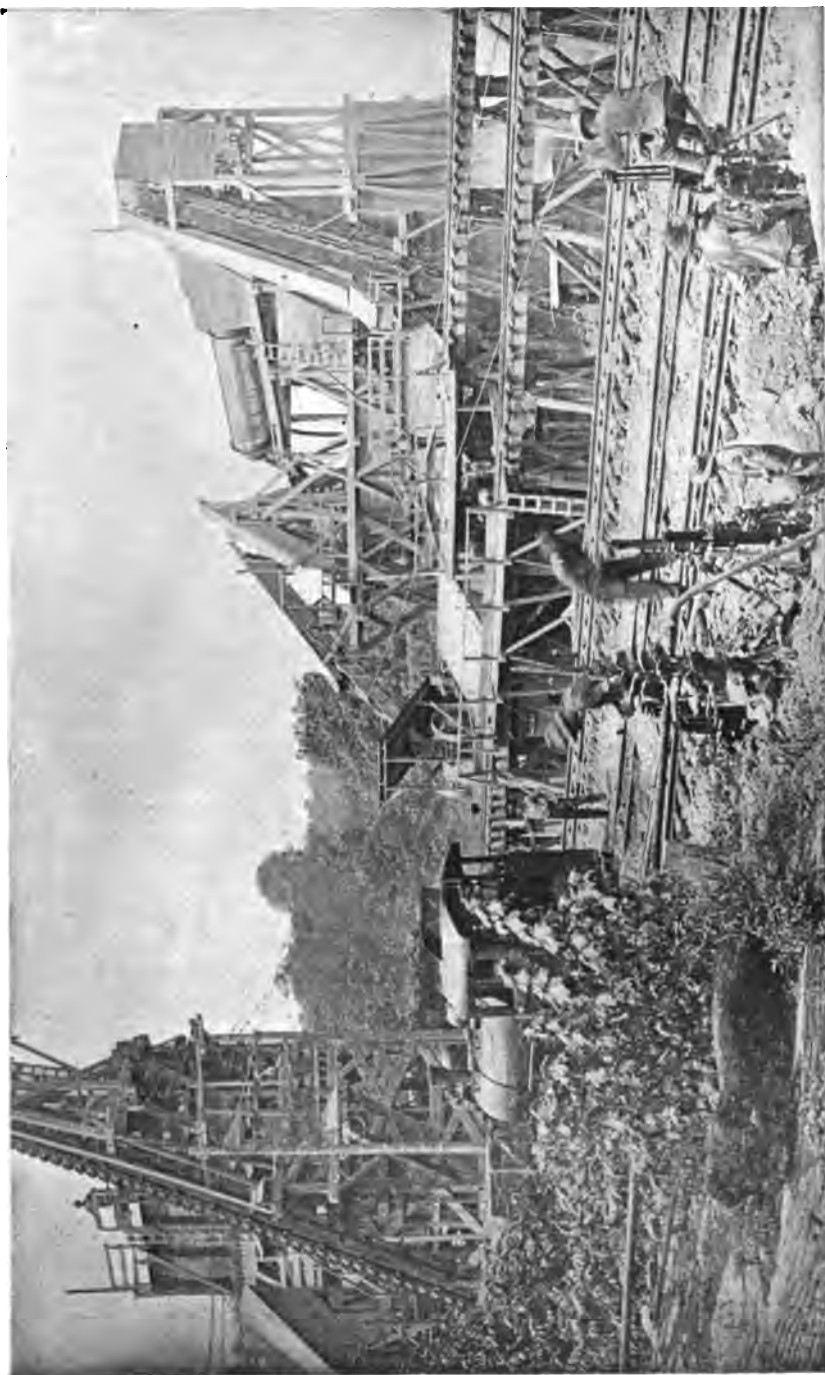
Contract 11. Main Crushing Plant for Two Upper Sections, Haines Concrete Plant. Drilling Trench in Advance of Aqueduct Construction.
